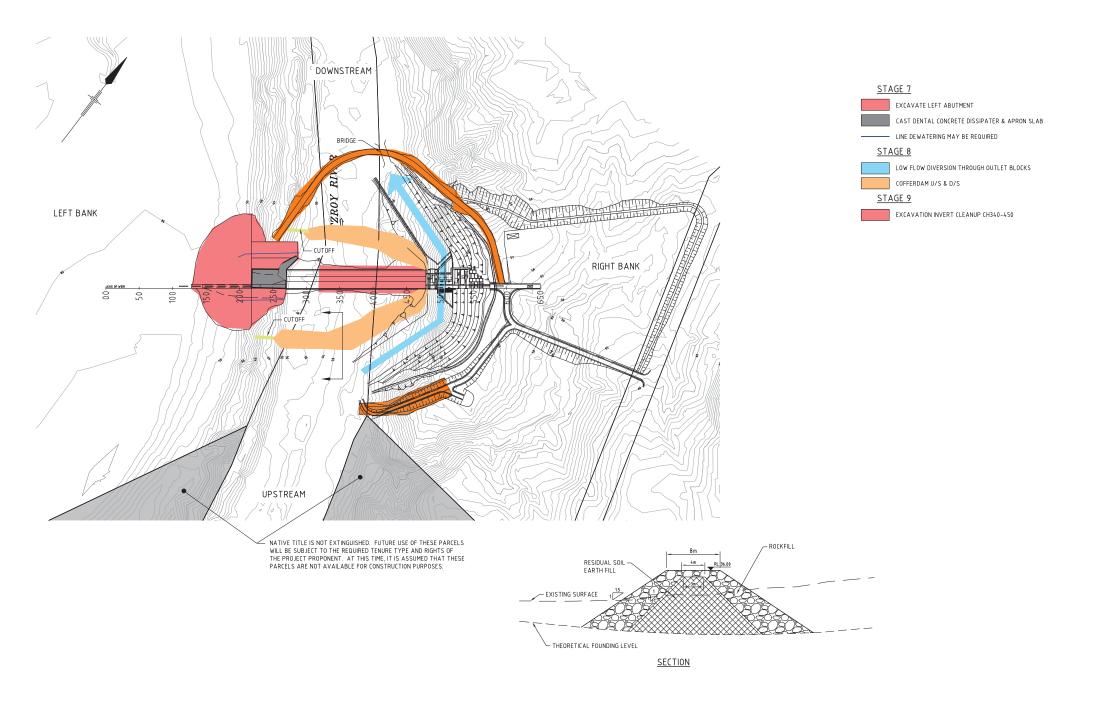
Rookwood Weir construction sequencing (Sheet 3 of 4)
